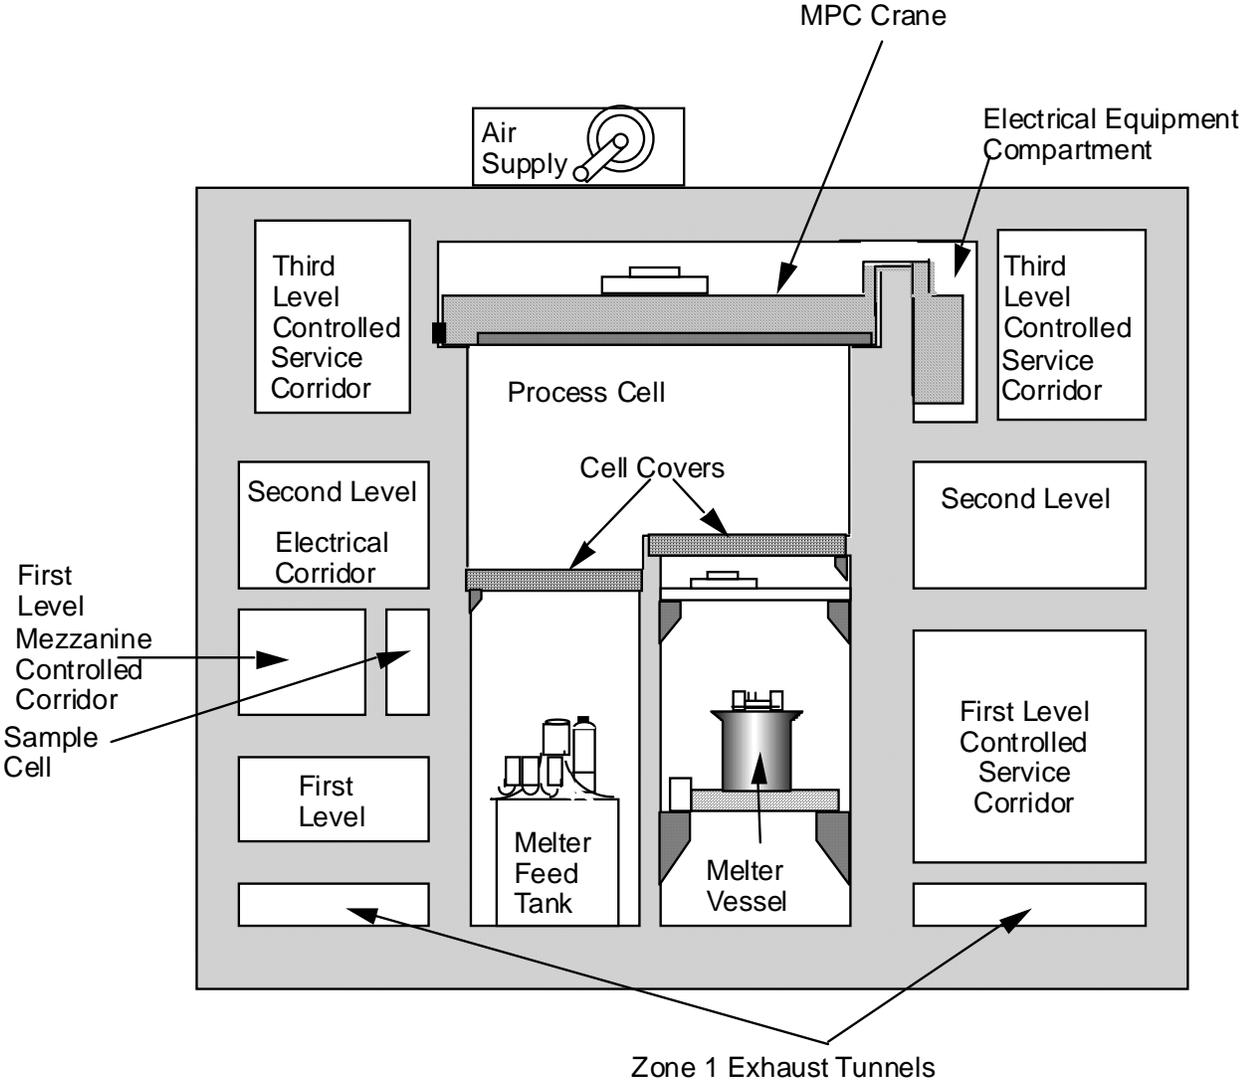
Vitrification Building Cross Section Through Melt Cell
